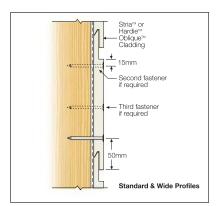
FACE FIXING GUN & BRAD NAILS
